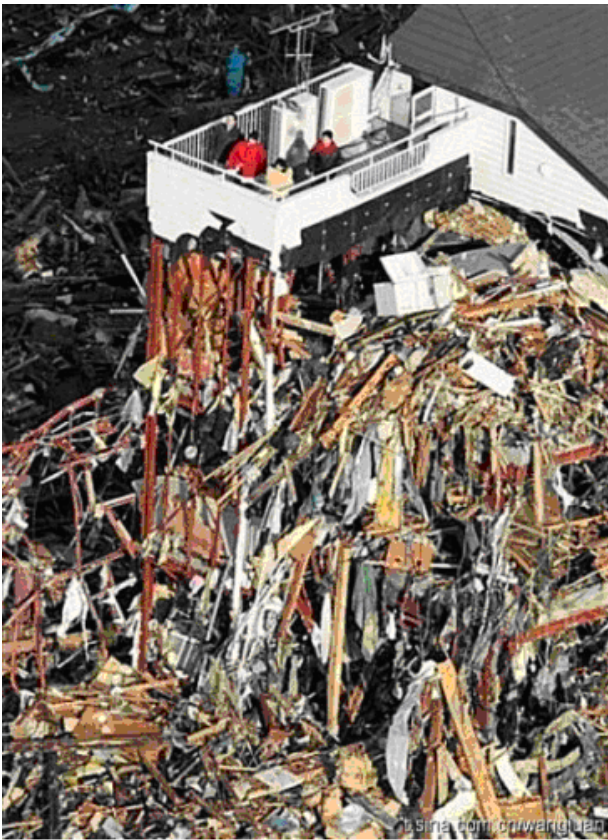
Home damaged during the 2011 Japanese tsunami.
